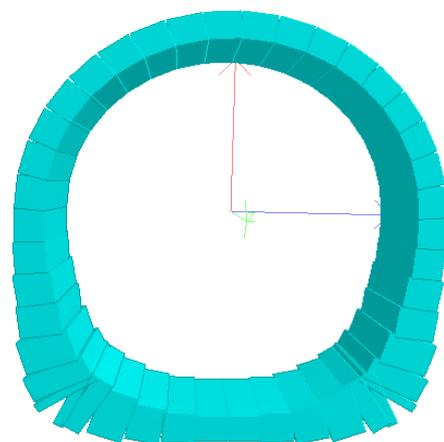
Horse- Shoe Shaped Concrete Lining of Head Race Tunnel
